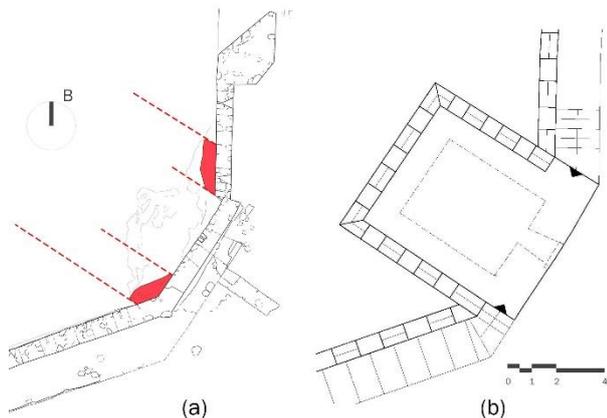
South elbow tower: a) ground plan of existing condition; b) ground plan of graphic reconstruction.
